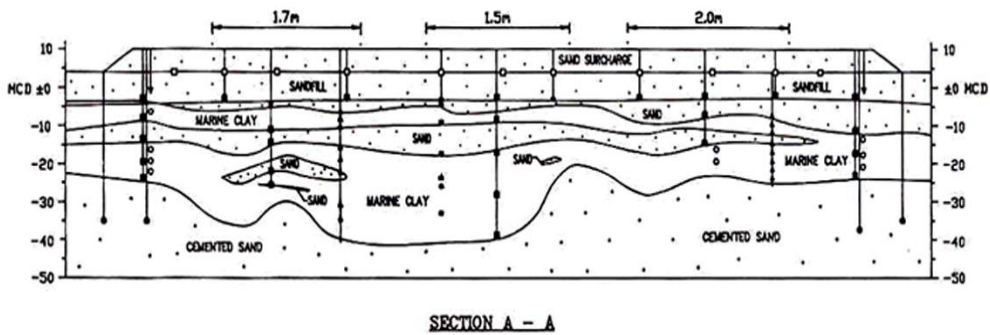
Cross-section of the pilot test area (after Chu et al. 2009a)
